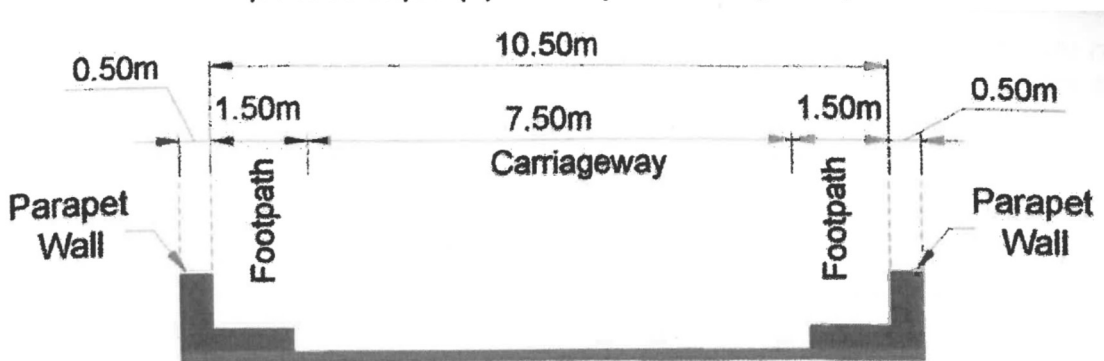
Typical cross section of Culvert at deck level for 2-Lane highway with footpath and without paved shoulder (Built-up Area - Mountainous terrain)
